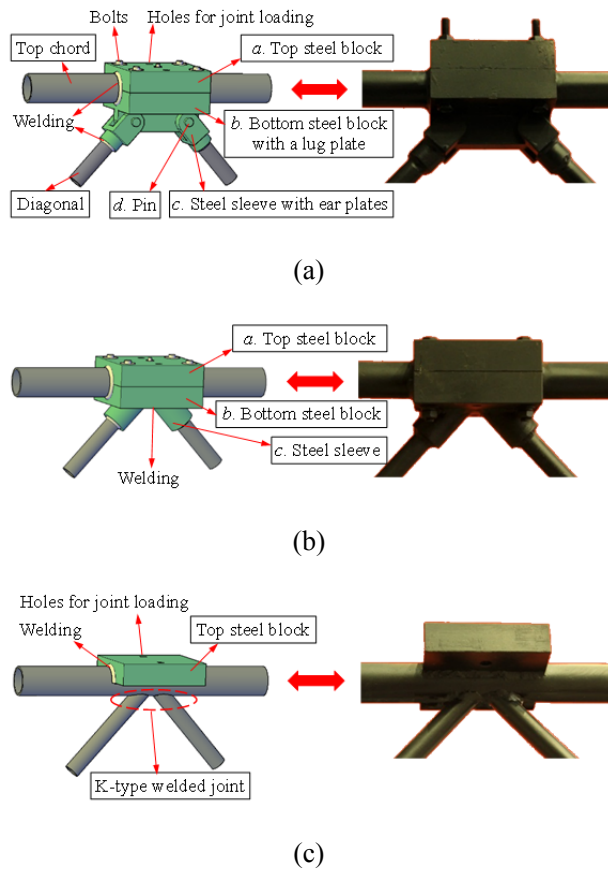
Joint construction details. (a) pinned joint connector in truss-PJ; (b) rigid joint connector in truss-RJ; (C) welded joint and attached steel block in truss-WJ
